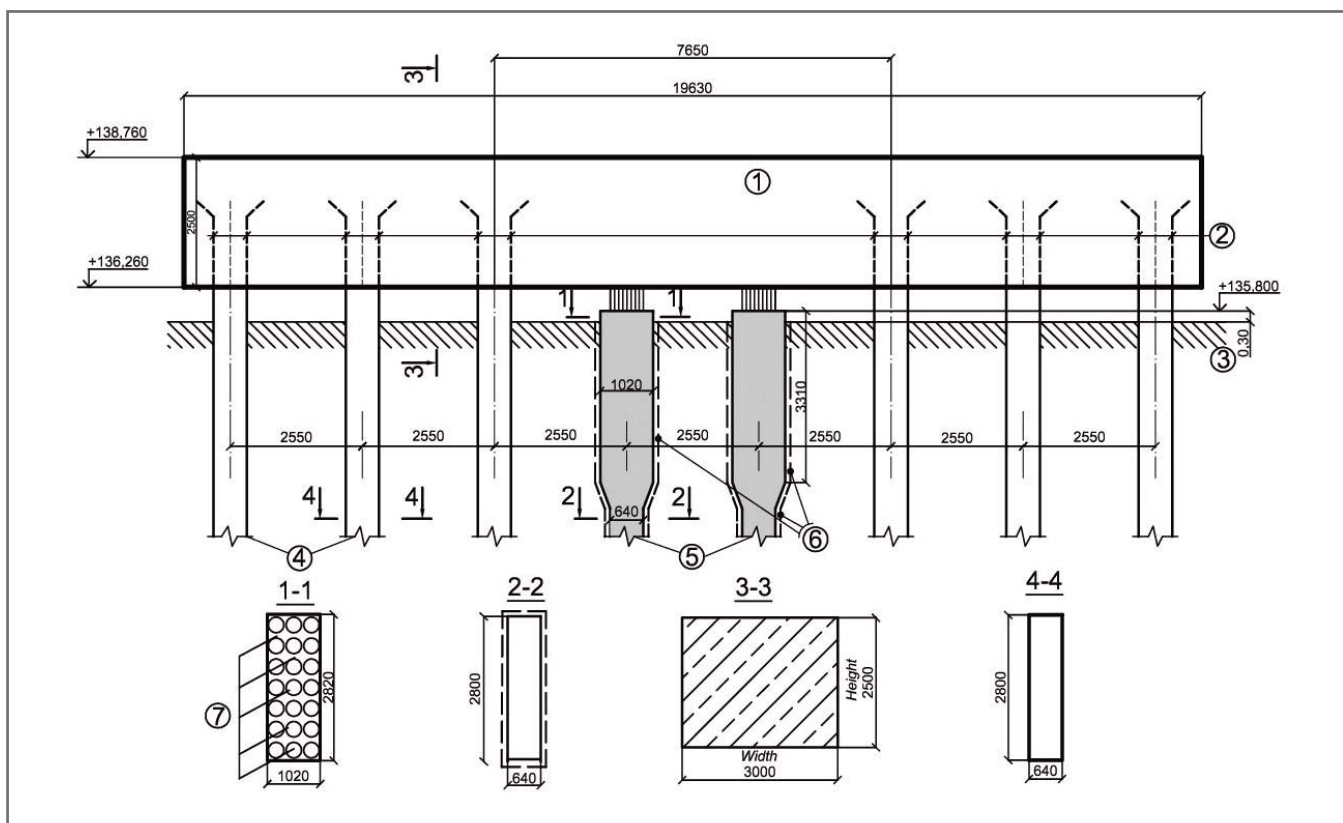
Structural scheme of soil testing with barrette piles: 1 – reinforced concrete beam; 2 – releases of barrette fittings; 3 – top of the head of the tested barrettes; 4 – anchor barrettes; 5 – tested barrettes; 6 – metal sheets along the perimeter of the barrettes; 7 – hydraulic jacks with a diameter of 300 mm (22 pieces) at the top of the barrette head; 8 – glass insulator along the barrette shaft
